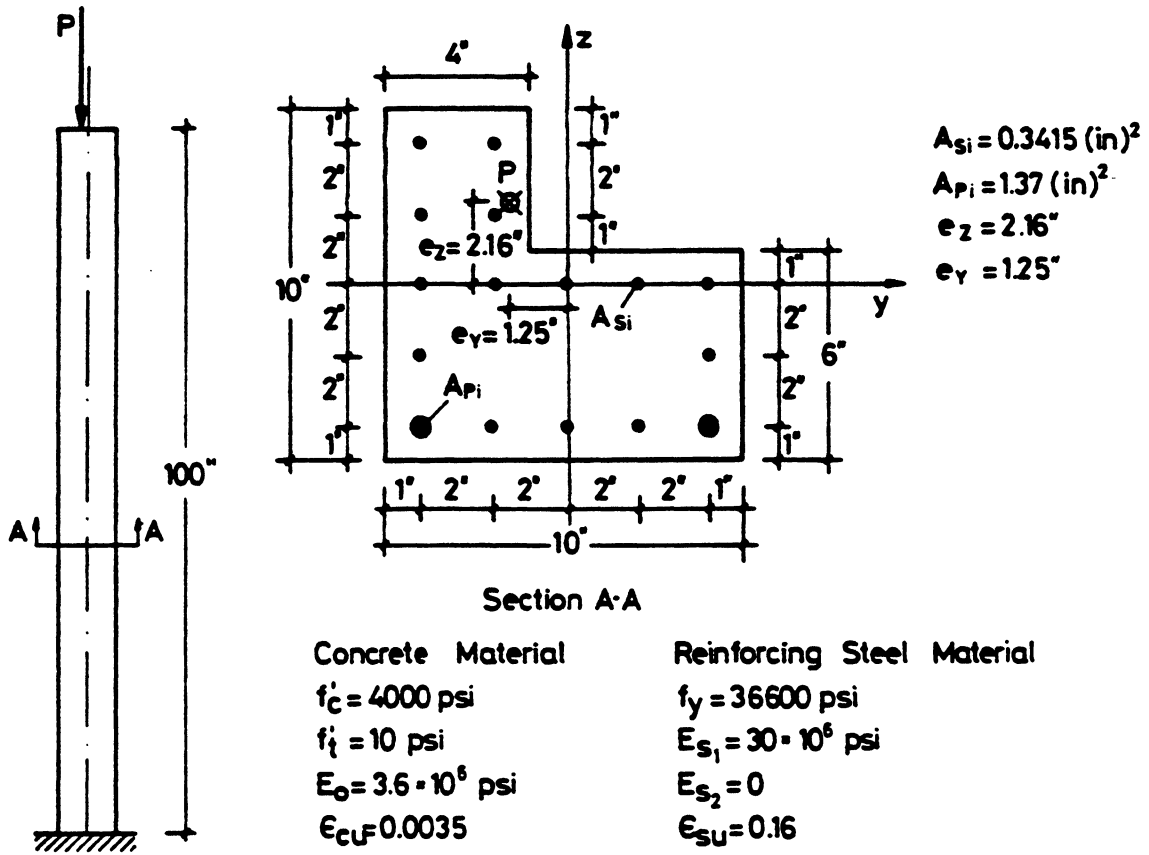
Biaxial Bending of a Prestressed Concrete Column
